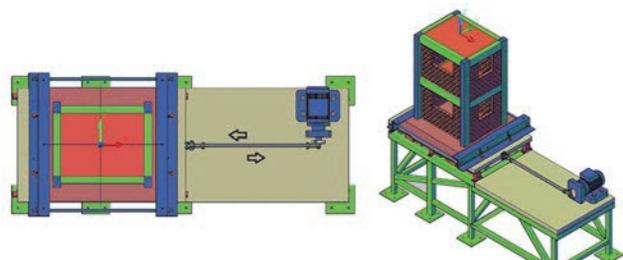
3D and plan view of Specimen 1 (angle: 0°)
